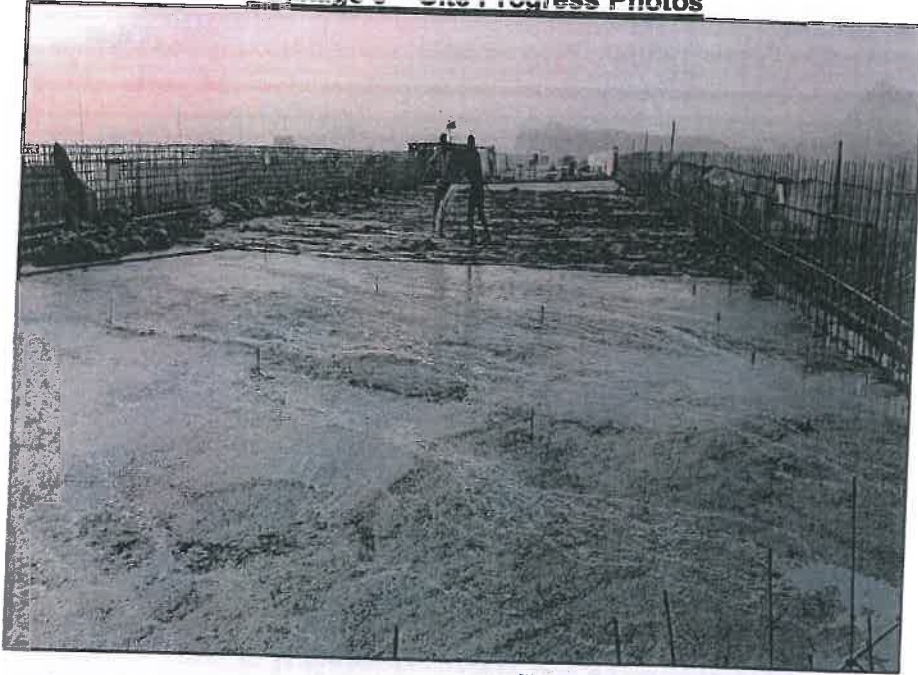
Deck slab concrete casting completed at RMP 273-274
